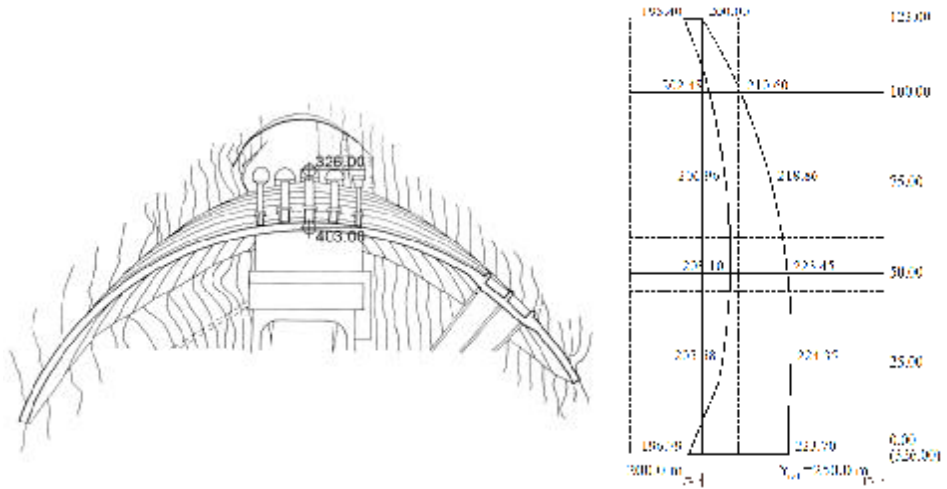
Plan of the dam's body with land topology (left) and cross section through central cantilever (right) [29]
